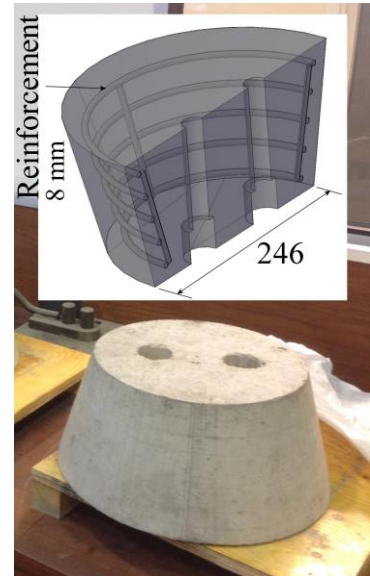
Concrete plug with half inside view used in LNSC pushout Tests 1 and 2
